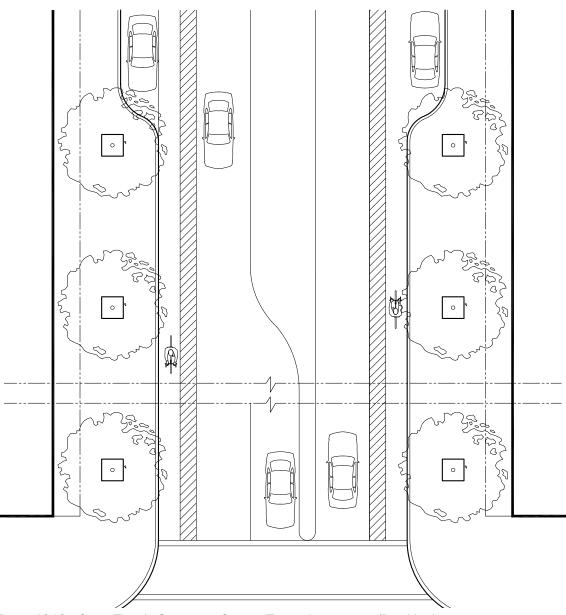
STREET TYPE 4: CONNECTOR STREET - TYPICAL INTERSECTION (PLAN VIEW)
